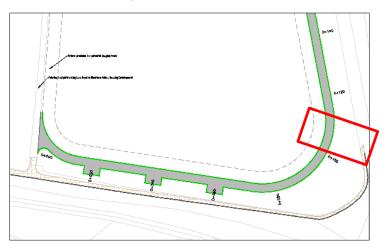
Existing / Proposed Footway (Dwg No. 11587-2420-D02)
